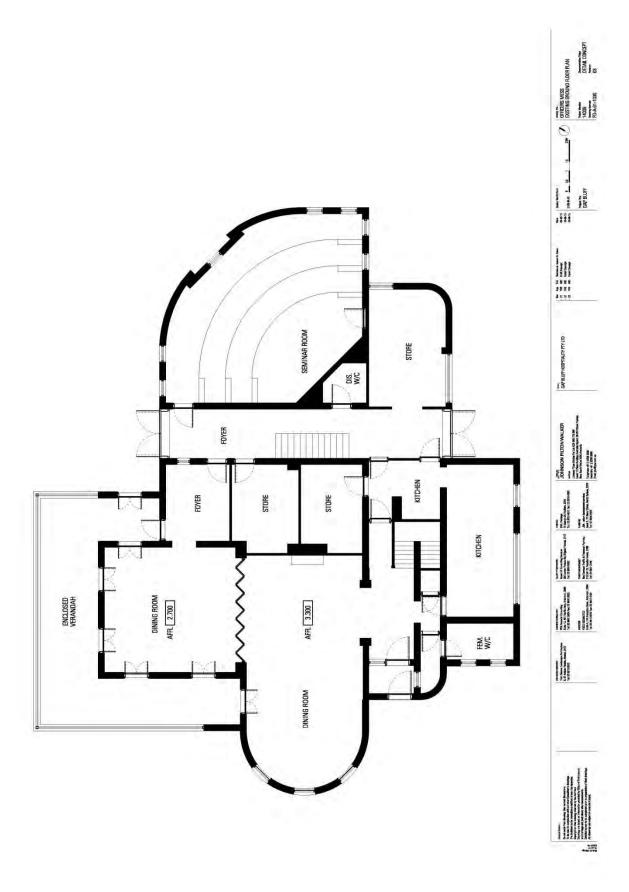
Existing ground-floor plan, Officers Mess. (Source: JPW 2015)
